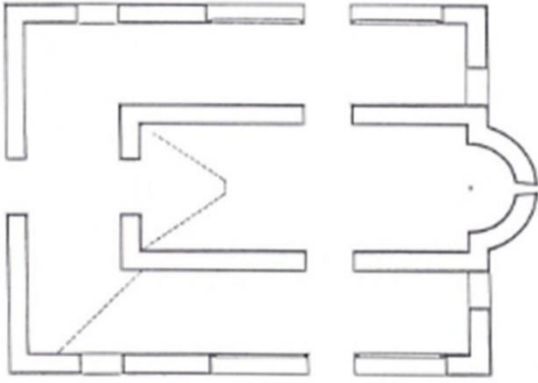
Plan of a single-aisle church with corridors on three sides
